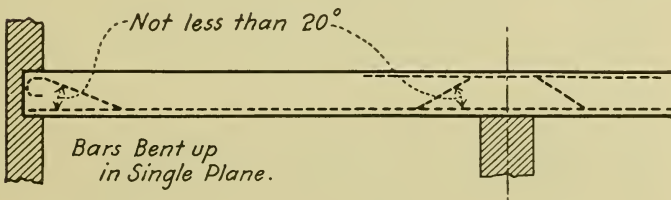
Typical Reinforced Concrete Beam; Principal Longitudinal Bars Bent up in Single Plane.
